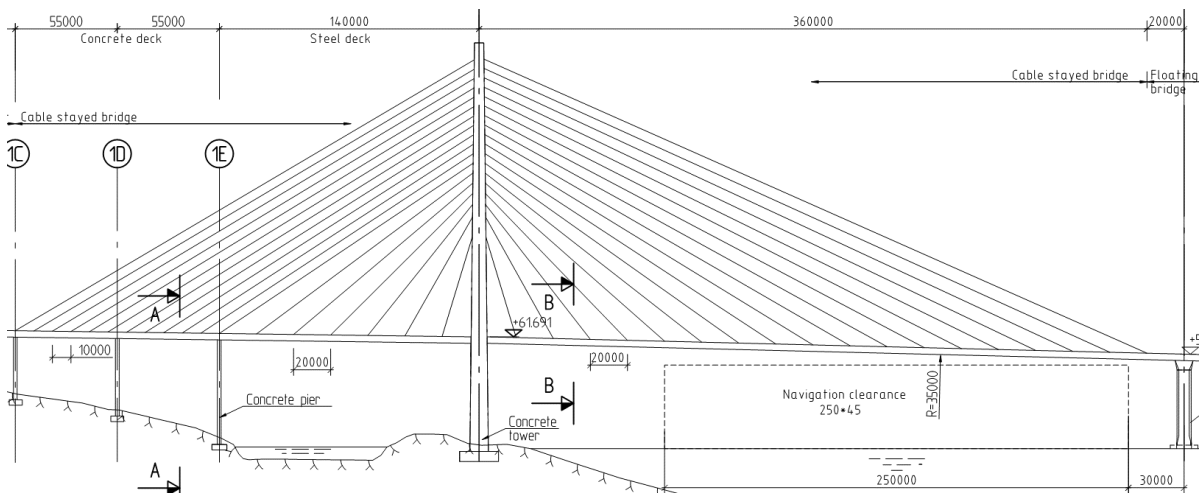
Bjørnafjorden high bridge, K12 alternative. Excerpt from drawing number SBJ-33-C5-AMC-22-DR-101.
